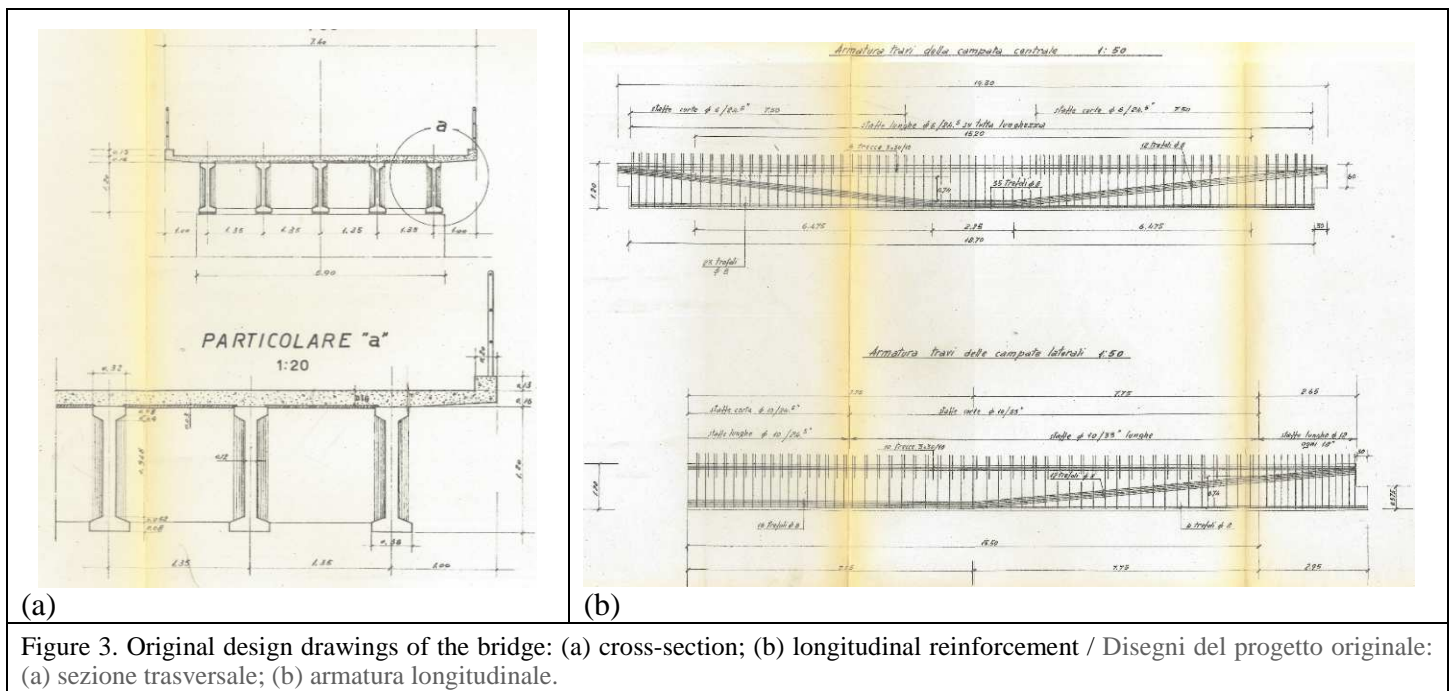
Original design drawings of the bridge: (a) cross-section; (b) longitudinal reinforcement / Disegni del progetto originale: (a) sezione trasversale; (b) armatura longitudinale.
